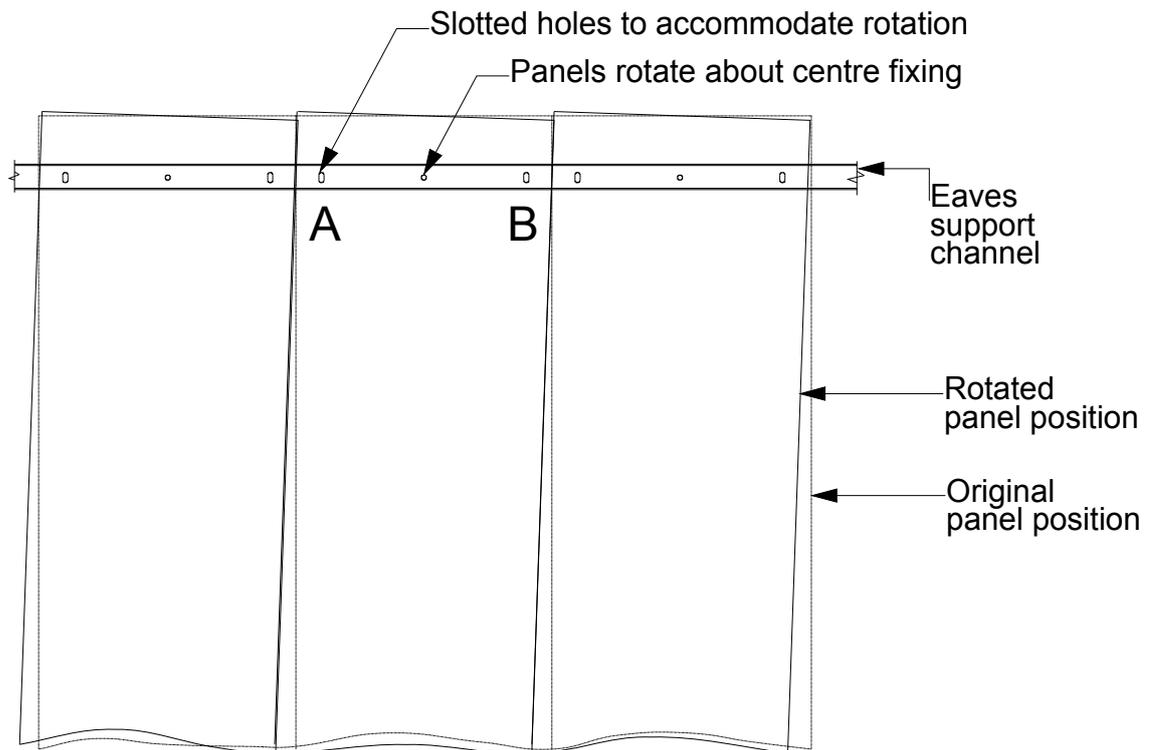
Displaced shape of abutting wall panels under in-plane loading. (Note that if the slotted hole details are not provided at A and B then there is a risk that the bolts will be sheared off as the panels rotate.)
